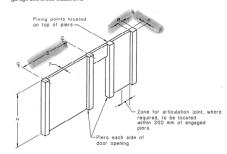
ENGAGED PIERS IN EXTERNAL SINGLE-LEAF WALLS
